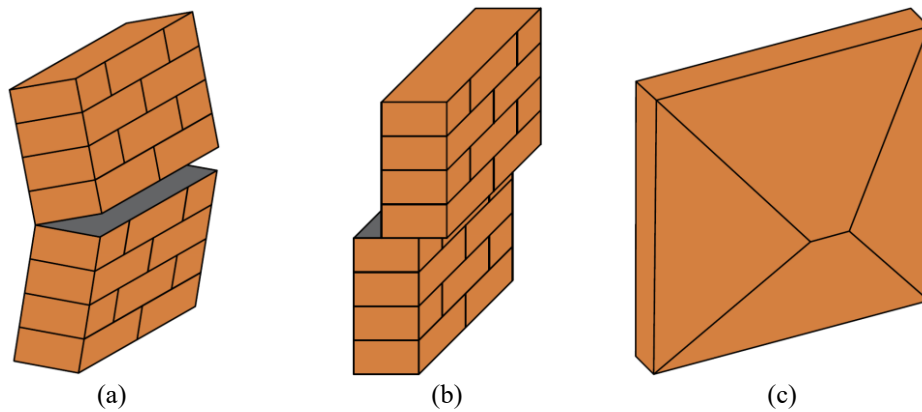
Out-of-plane failure modes of URM components: (a) flexural failure; (b) sliding shear failure; (c) two-way bending failure
